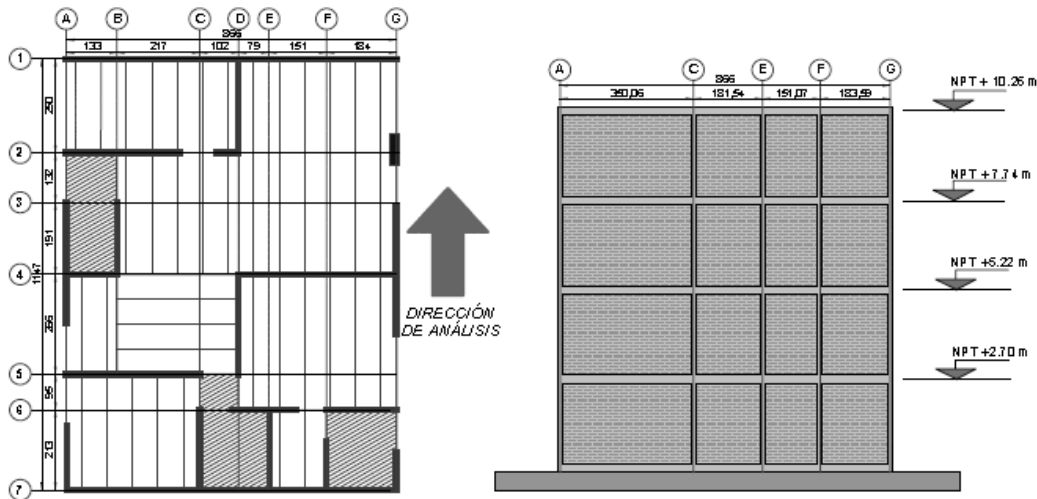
Structural layout of the test four-story CM building built of hand-made clay-brick.
